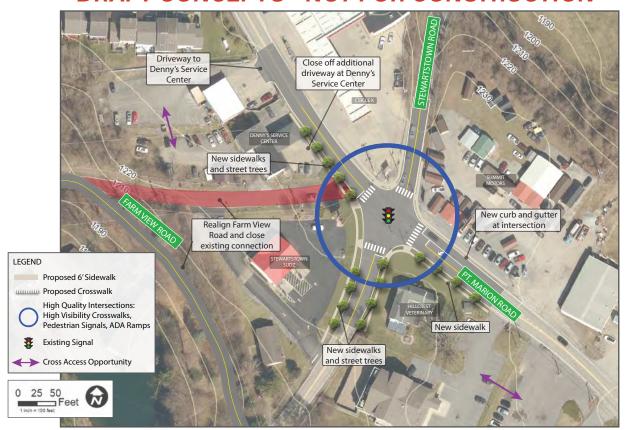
Conceptual design of Point Marion Road / Stewartstown Road - Farm View Road realignment.
